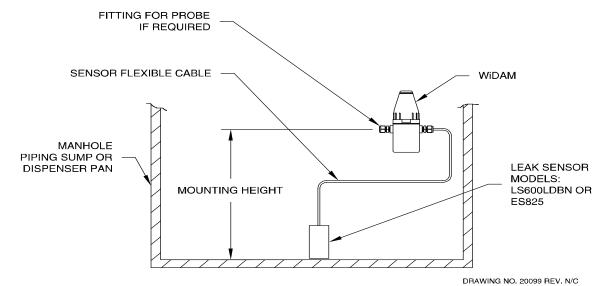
Leak Sensor Installation in Piping Sumps, Manholes, and Dispenser Pans
